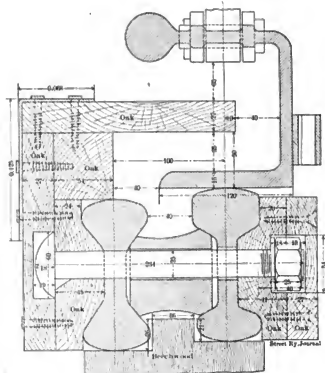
SECTION OF THIRD-RAIL CONSTRUCTION USED BETWEEN STATIONS, ORLEANS RAILWAY
